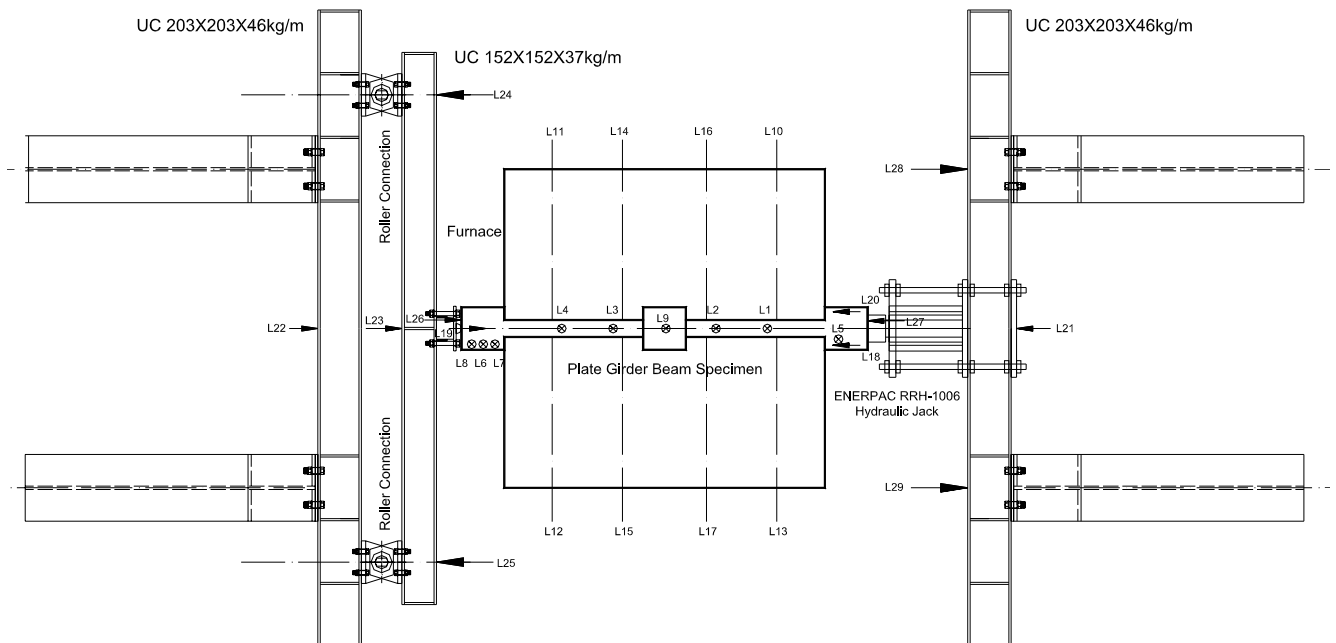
Restrained Plate Girder Test Set-up (Plan View)
